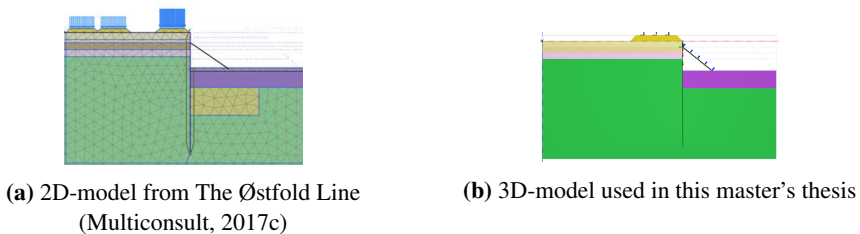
Modelling of the sheet pile wall adjacent to the track
